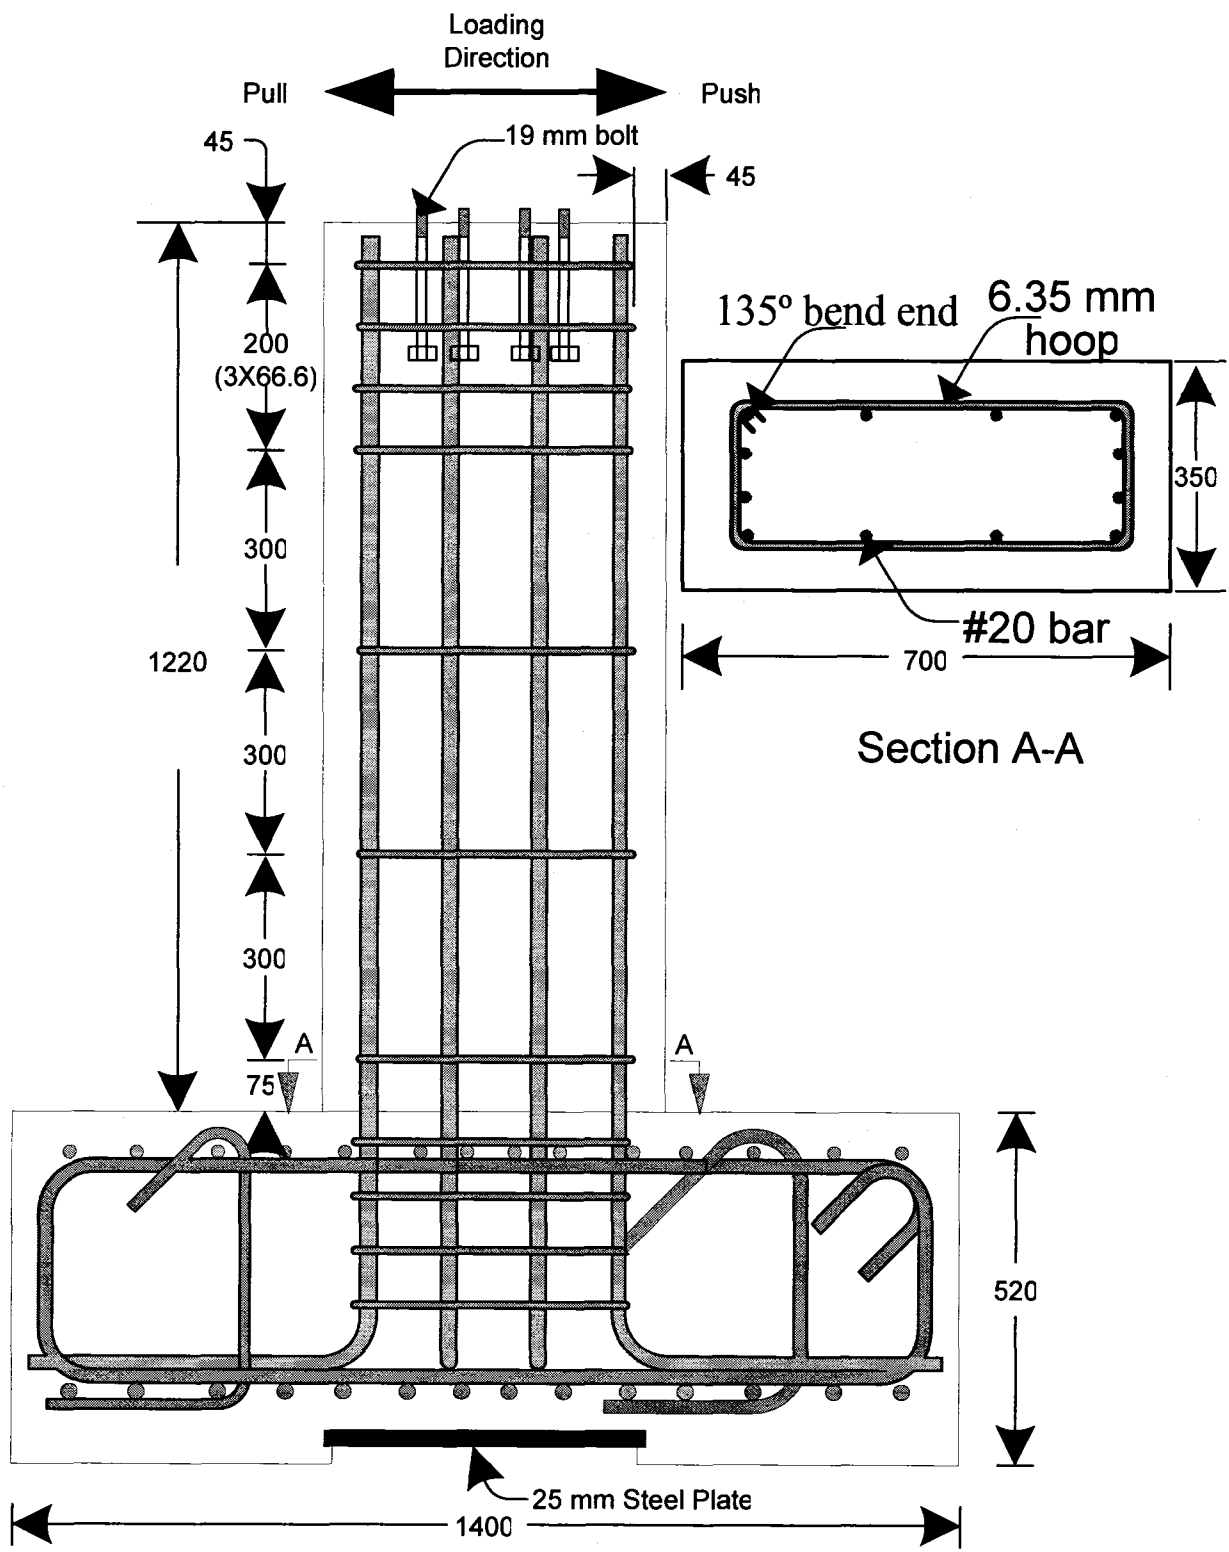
Geometry and reinforcement details for Columns RR-C and RR-R
